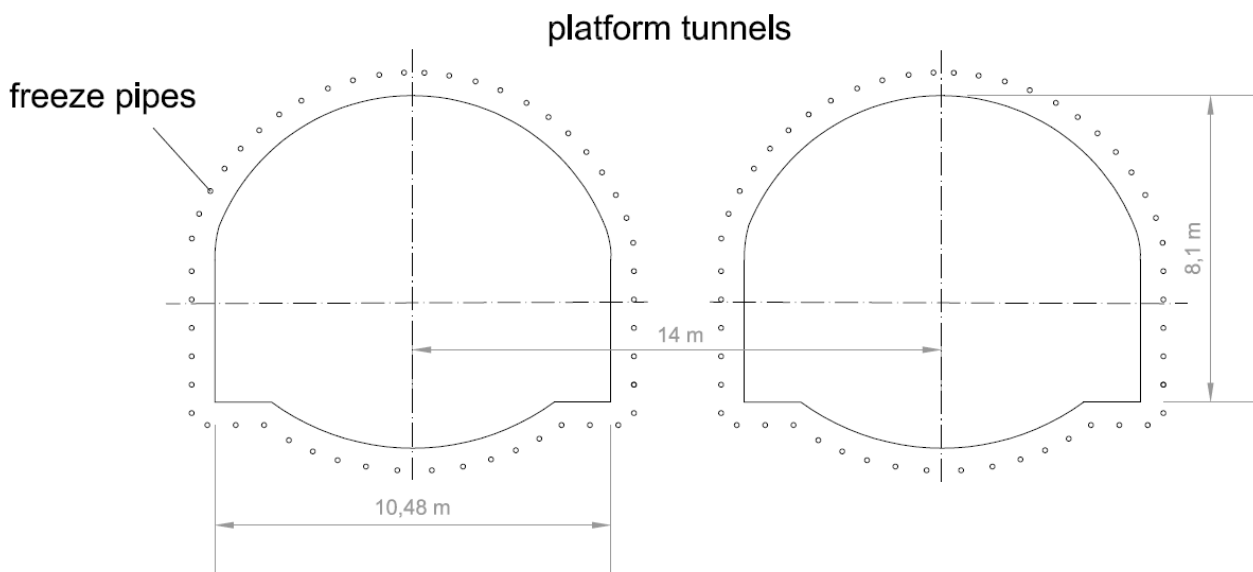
Cross section of platform tunnels along Tratta Bassa
